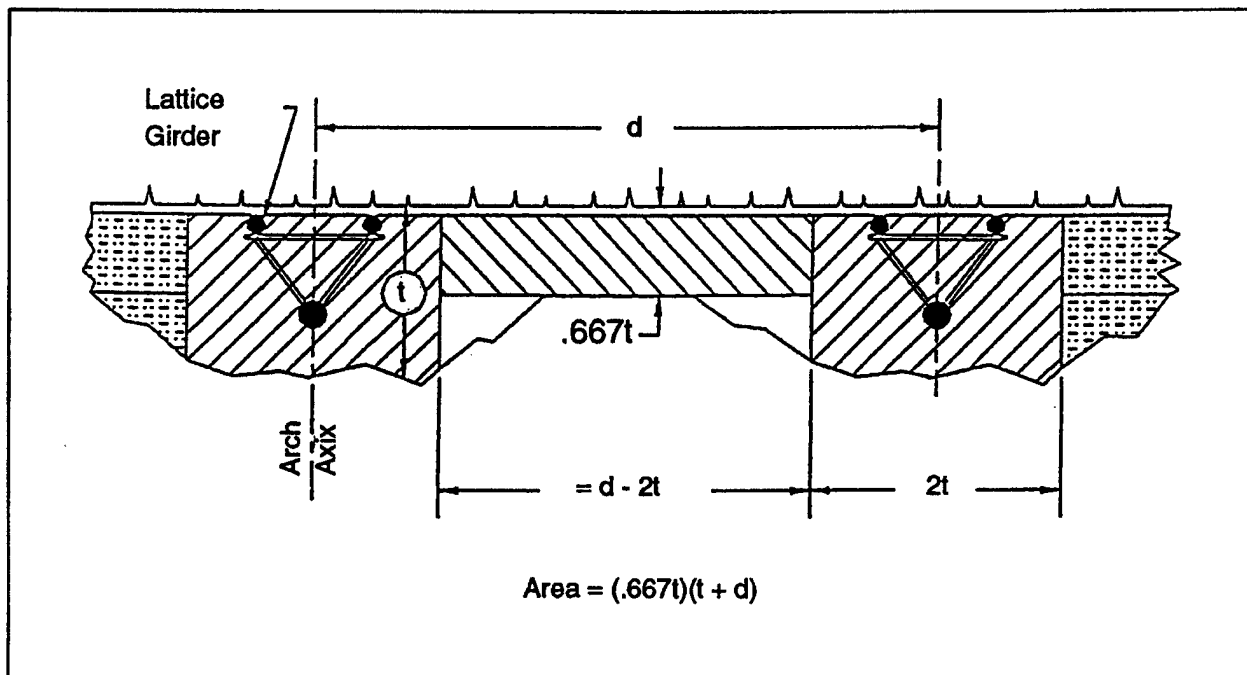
Estimation of cross section for shotcrete-encased lattice girders
